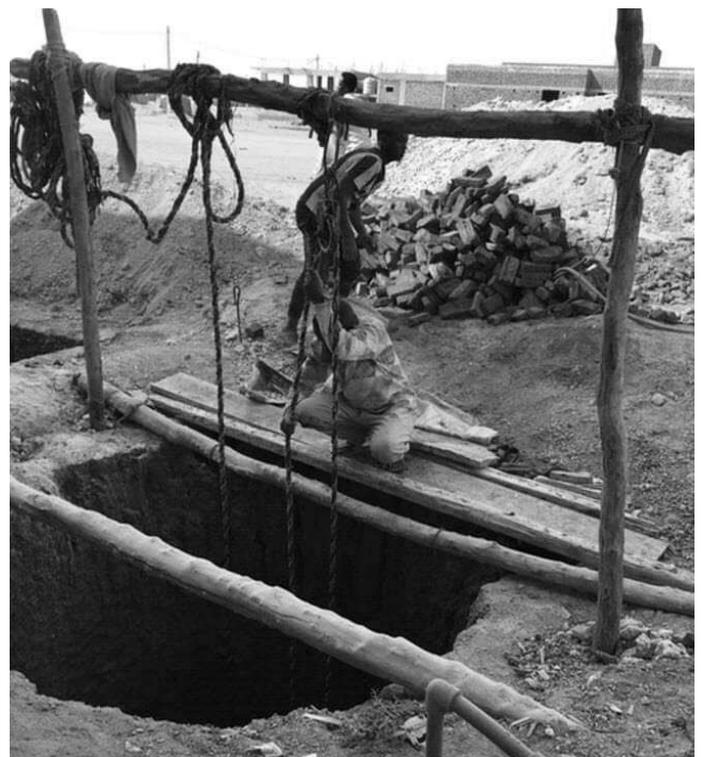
Manual Excavation of Wastewater Disposal Well – Khartoum
